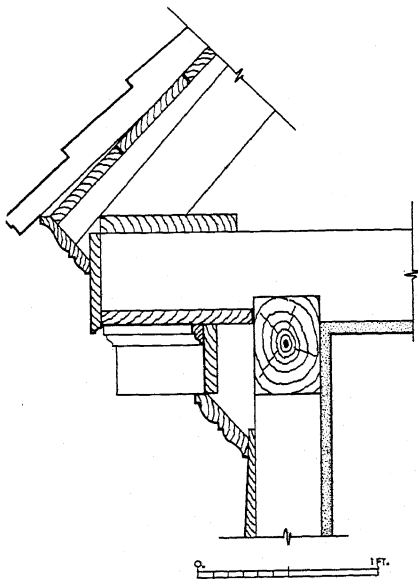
EAVES DETAIL OF A FRAME HOUSE.
